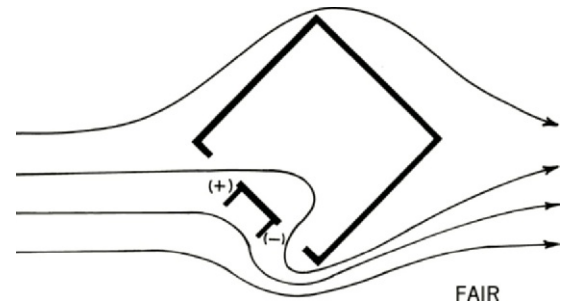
Fin walls can significantly increase ventilation through windows on the same wall. (After Art Bowen, 1981.)
